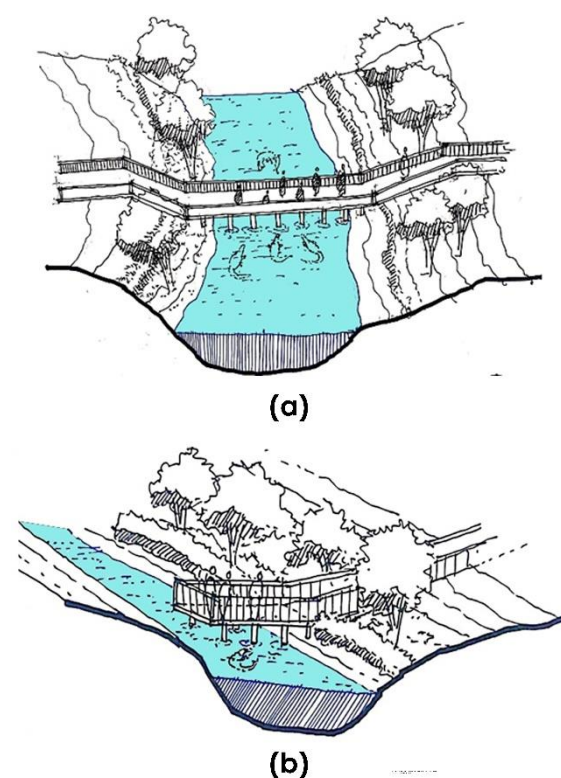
View of river showing proposed (a) full bridge, (b) half bridge.
